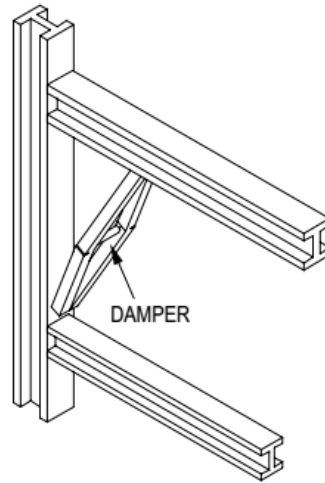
The construction detailing of a typical bracing system with a FVD (Sigaher and Constantinou 2003)
